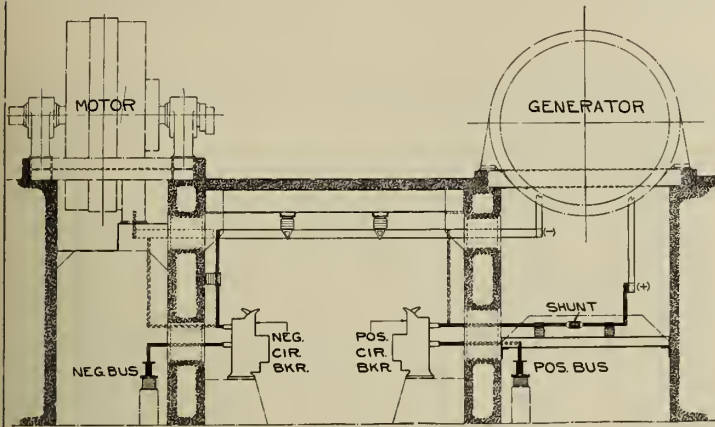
Arrangement of circuit breakers, buses, and connections in hot strip mill basement control room.
